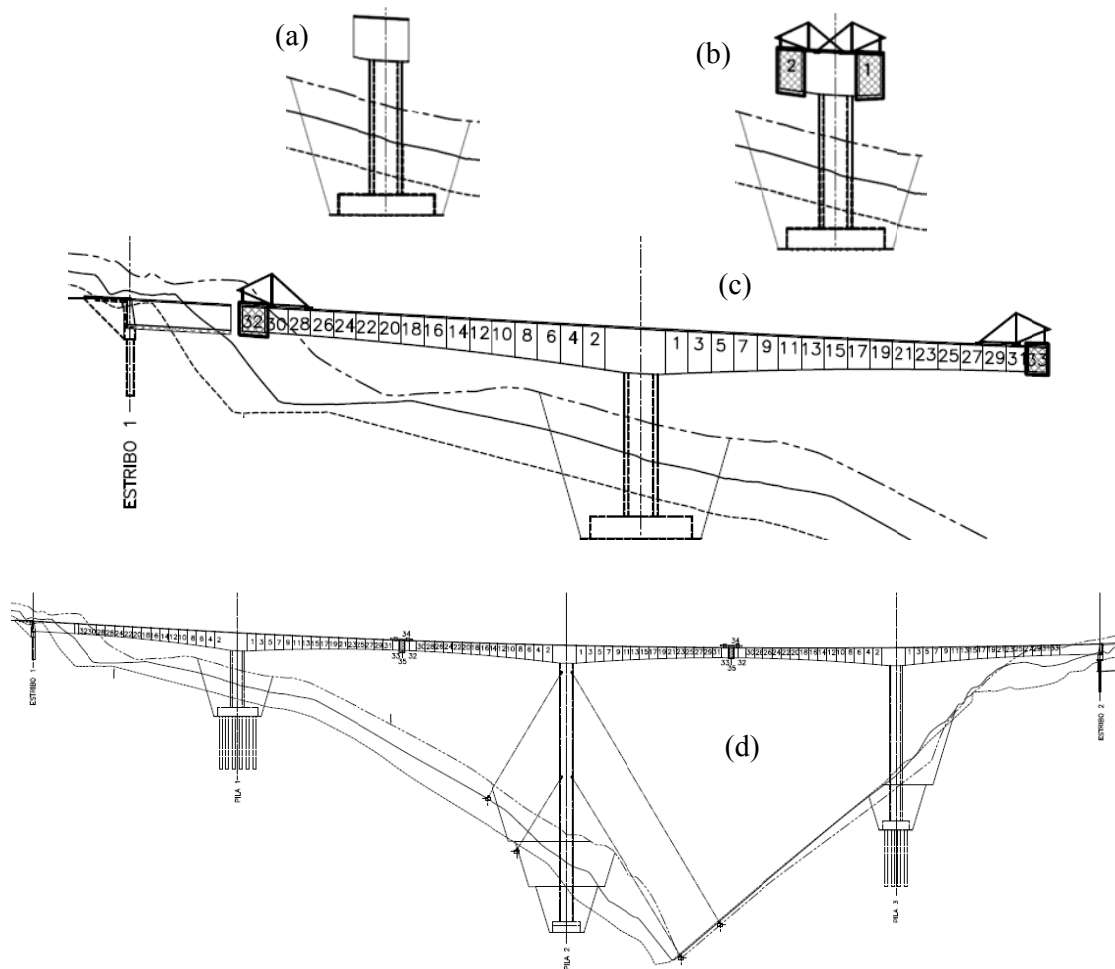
Description of some bridge construction stages (a) Construction of pile and pile segment
